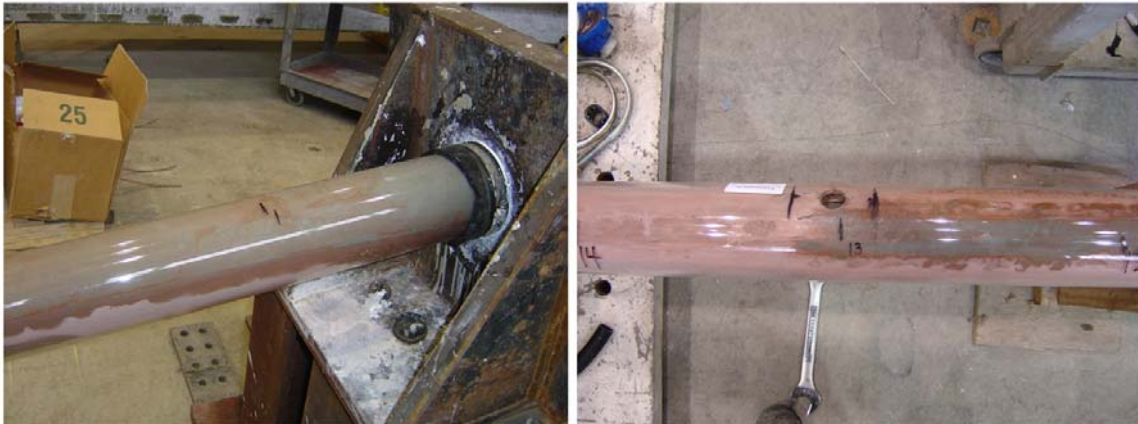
Repair Grouted Ducts of Specimen PG-C3-2.
